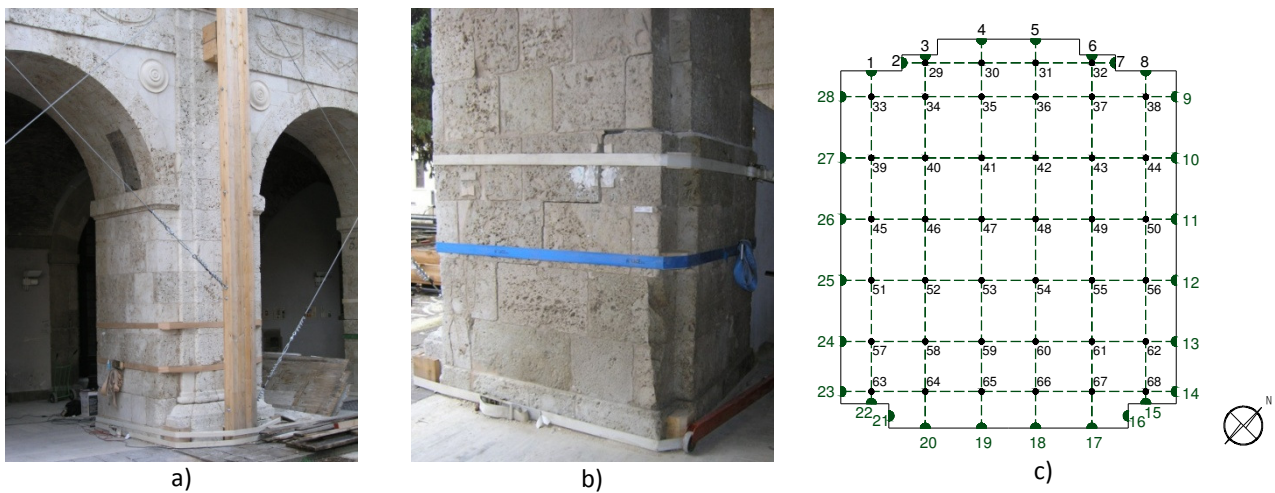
a) Pillar no. 4; b) pillar no. 6; c) test layout reported on a horizontal section of the pillar (pictures and layout by the author).
